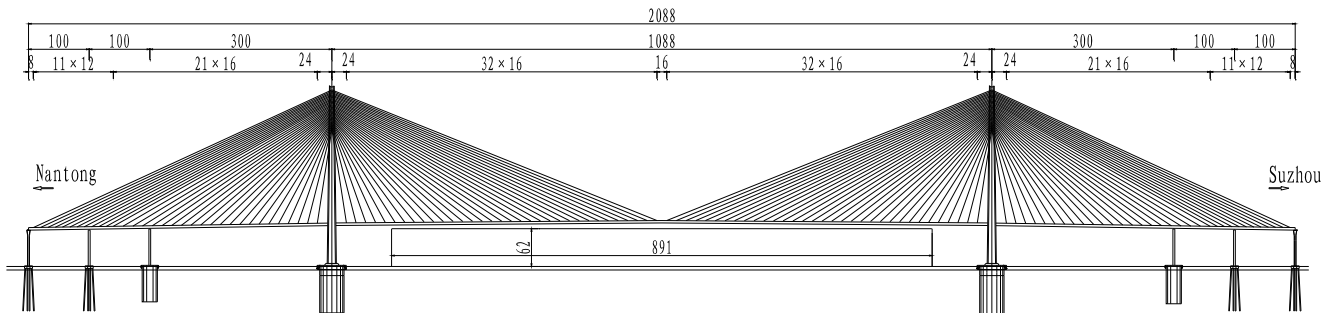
Elevation of the Jiangsu Sutong Bridge (Dimensions in m)
